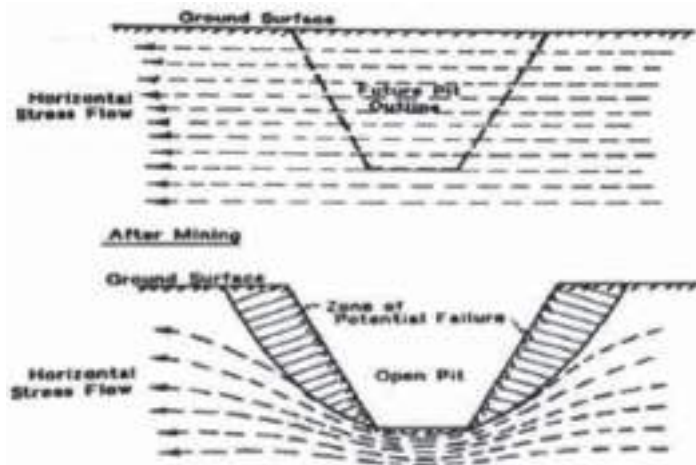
Stress relaxed zone around the pit walls of an open pit (schematic)
